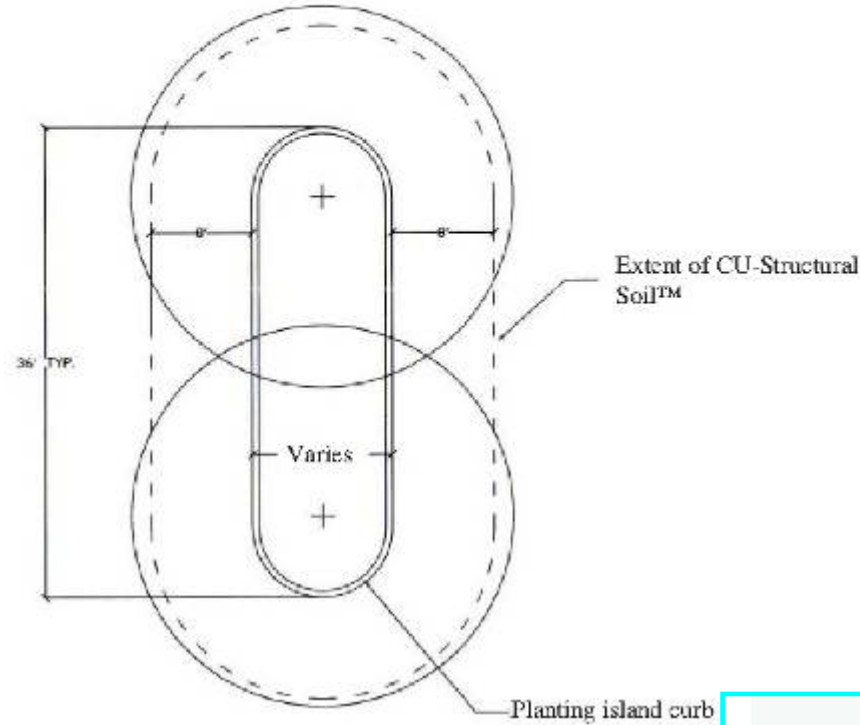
Potential use of CU-Structural Soil™ to enlarge planting islands in parking lots without taking up parking space.
